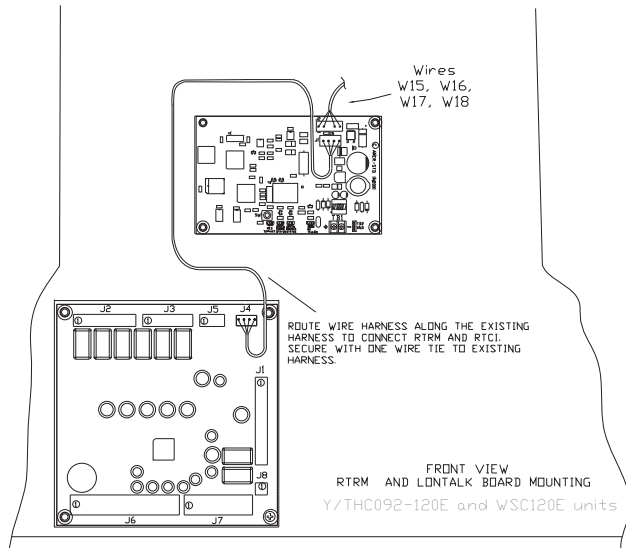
LonTalk® communication interface board mounting and wiring 12.5 to 25 tons packaged rooftop units - larger control panel
